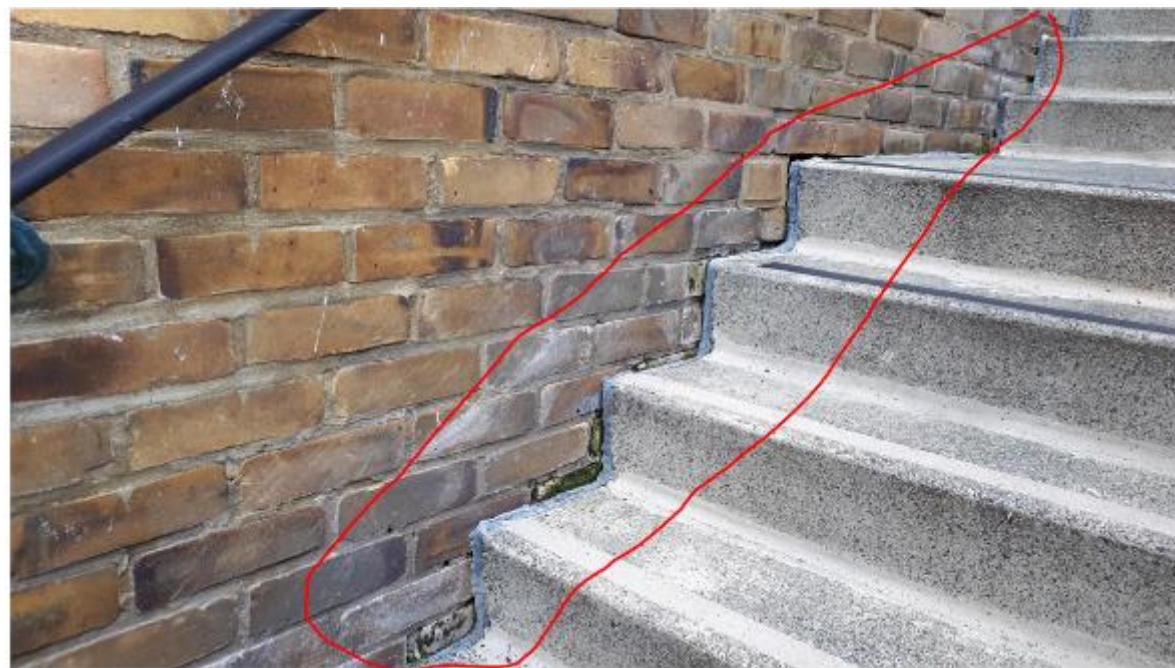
Same stairs, see previous attempt at making good joint between steps and brickwork.
